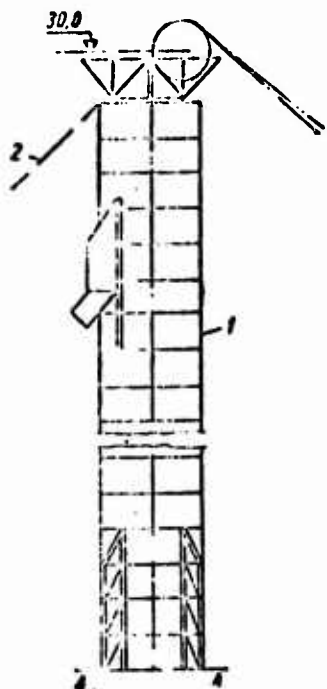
Boomless cylindrical metallic pile driver: 1 - cylindrical mount (pile driver); 2 - possible position of the guy wire.
